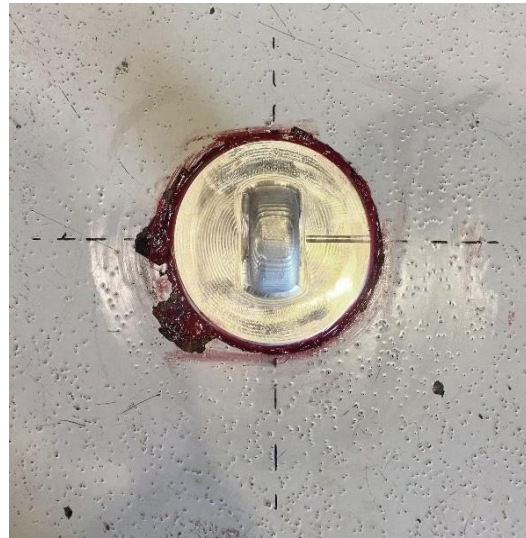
ILDFA tie down point chemically anchored into concrete slab.
